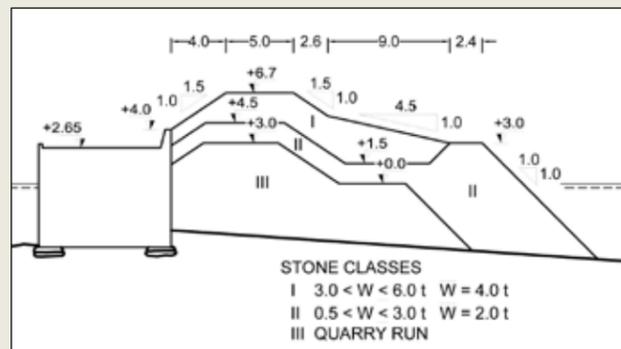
Cross-section of the design of the Hofsós berm breakwater from 1983 on the seaside of an existing pier for overtopping prevention.
